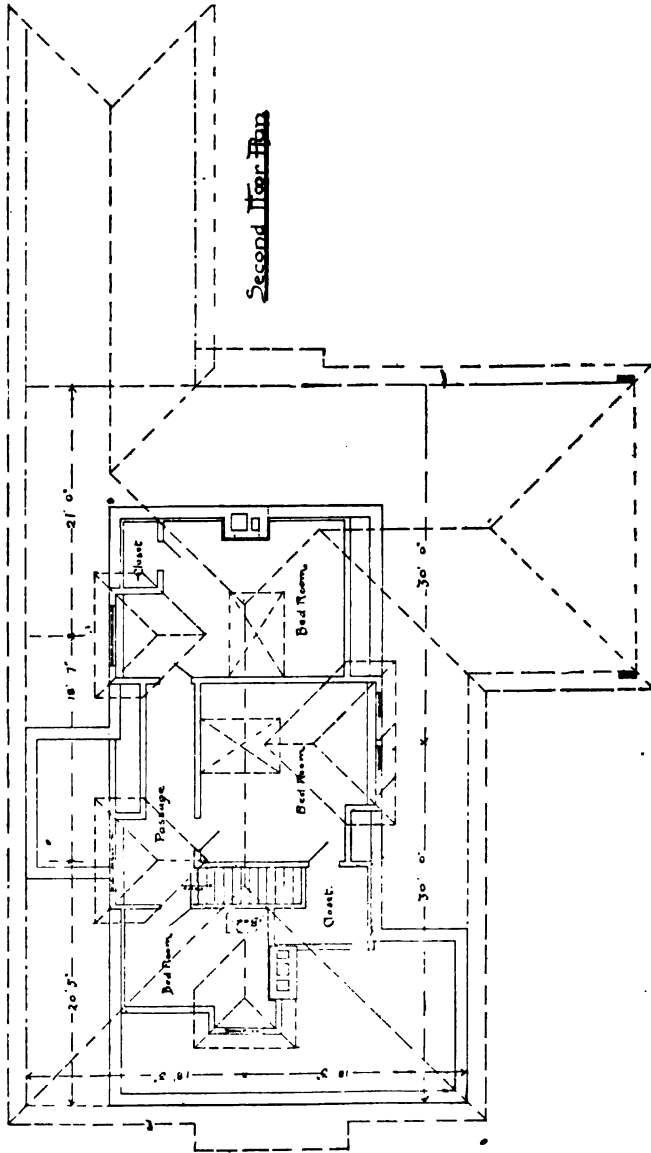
SECOND FLOOR PLAN OF LOCAL PASSENGER DEPOT AT OAKDALE, LONG ISLAND R. R. (PLAN NO. 89—CONTINUED.)
